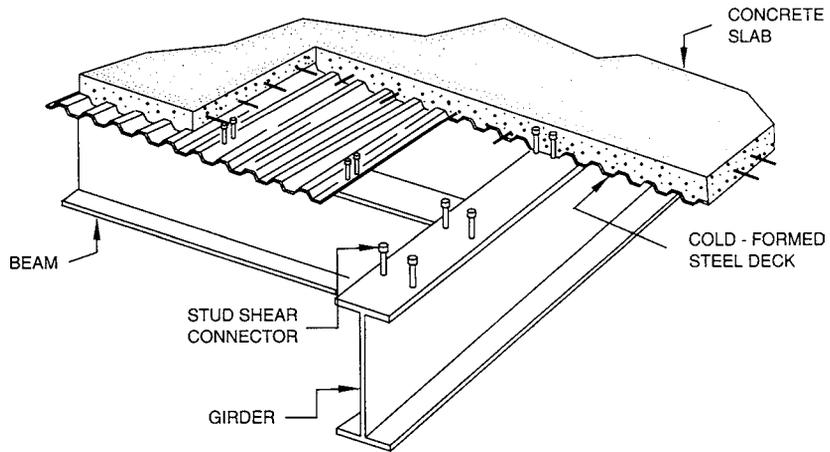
Beam and girder with shear connectors for composite action with concrete slab.
